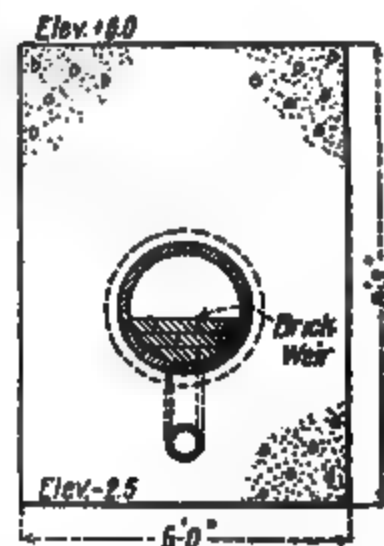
Standard submerged sewer outlet, Chicago, Ill.
